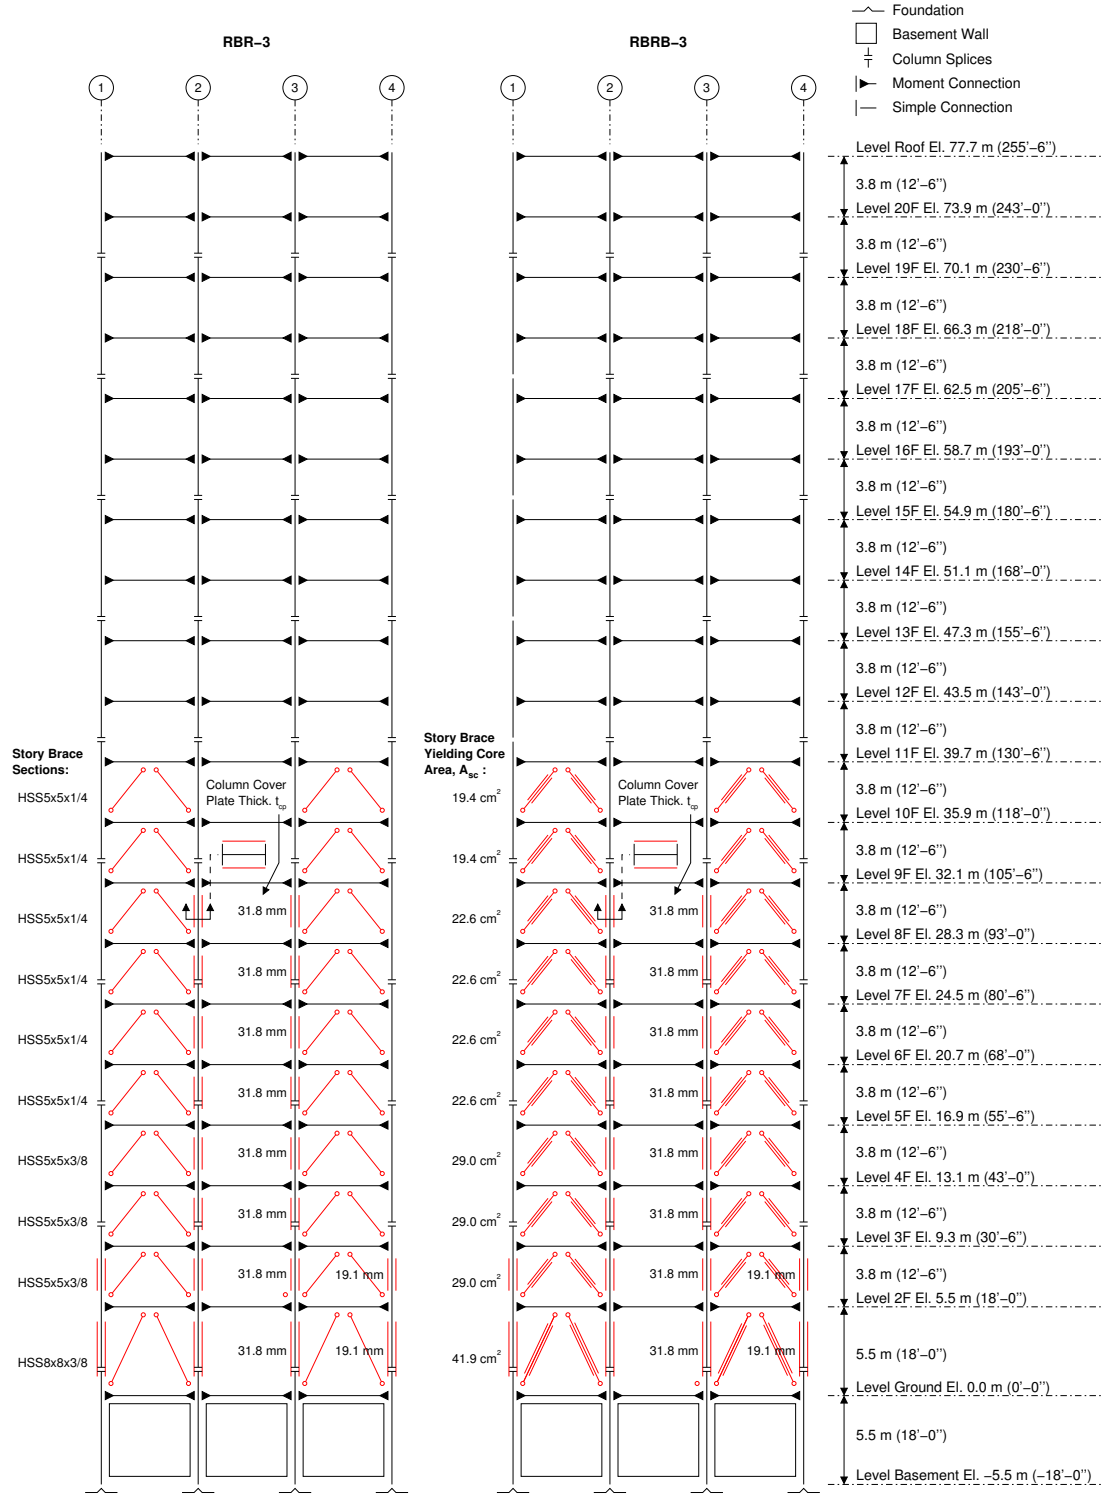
Elevation view of frames A of retrofit schemes RBR-3 and RBRB-3.
